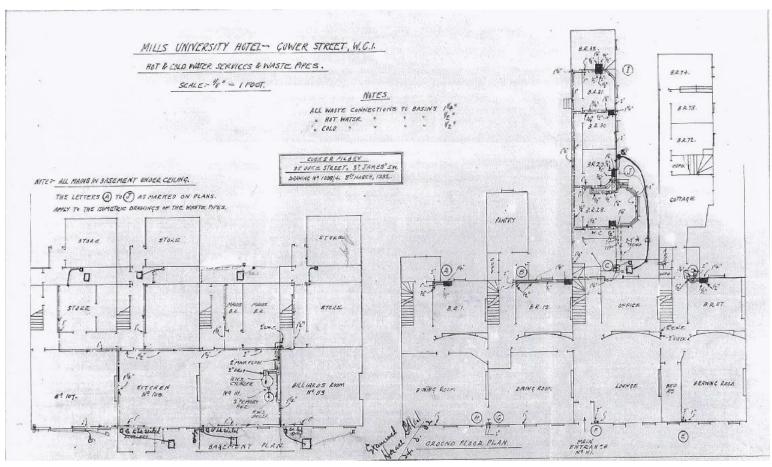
1932 Drainage Plans of Mills University Hotel (107-113 Gower Street): Basement and 1st
